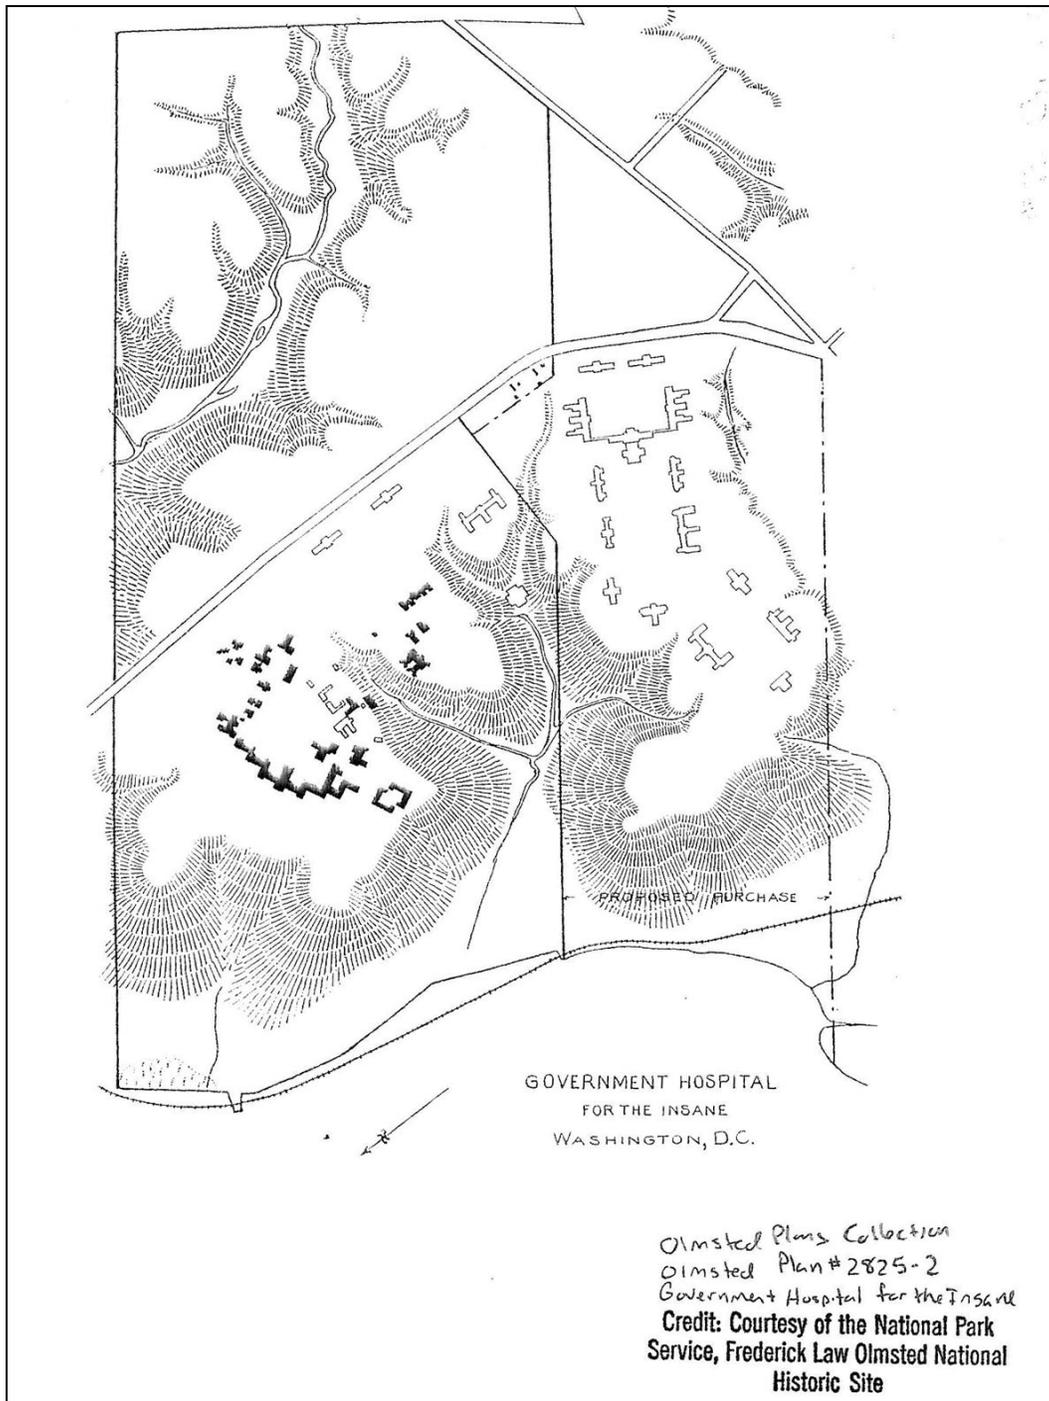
"Government Hospital for the Insane" shows Olmsted's recommendations for locations of new buildings after his site visit in 1901. The plan depicts four potential building locations, along with the "Proposed Purchase" of the grounds to the south. Courtesy NPS Frederick Law Olmsted National Historical Site.
